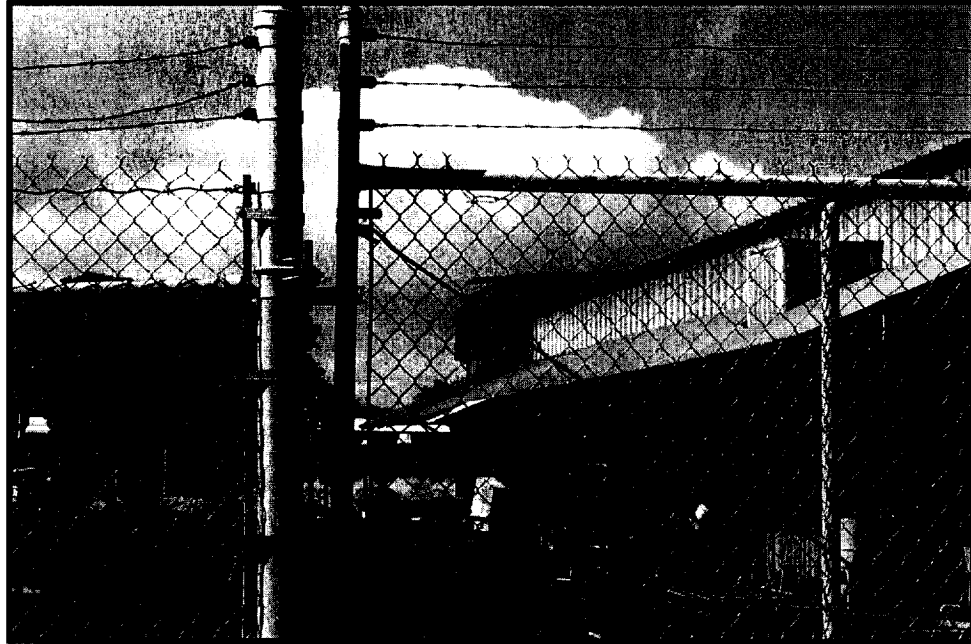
3000 block of Power Inn Road. A roof has been attached to the side of this rusted corrugated metal building to help protect the structure. The interior of the building is exposed at cracks where the roof and air units are attached. Additionally, materials are being stored outside of the structure indicating a lack of space.
